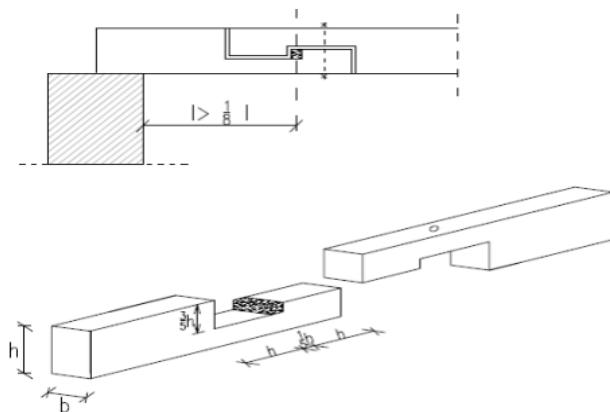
Replacement of the damaged support fragment of a beam in the distance bigger than $1/8 l$ (a_1-a_1 cross-section) using a lap joint with a wedge (drawing: E. Piotrowicz)
